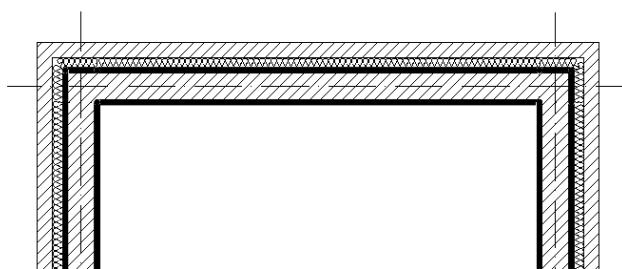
Wall with the pen of line separating the wall load-bearing layer at 0.5 and the line separating the load-bearing layer of the wall at 0.18 (like other pens)
